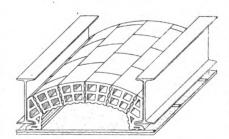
Tile are lipped so entire ceiling can be torn away and yet the I-beams will be adequately fireproofed
